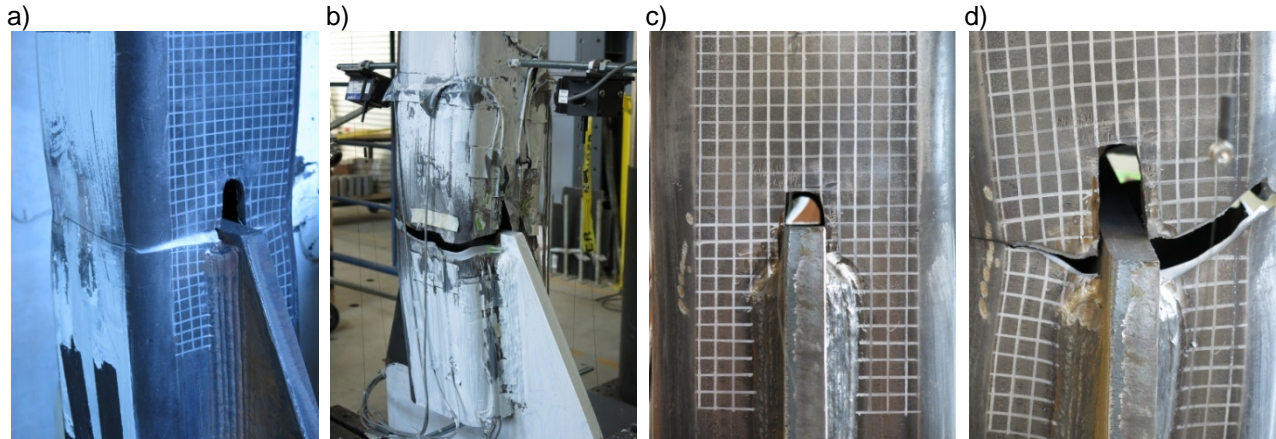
Close-up views of the slotted tube-to-gusset plate connection showing net-section fracture for specimens 3 (a) and 4 (b,c,d)
